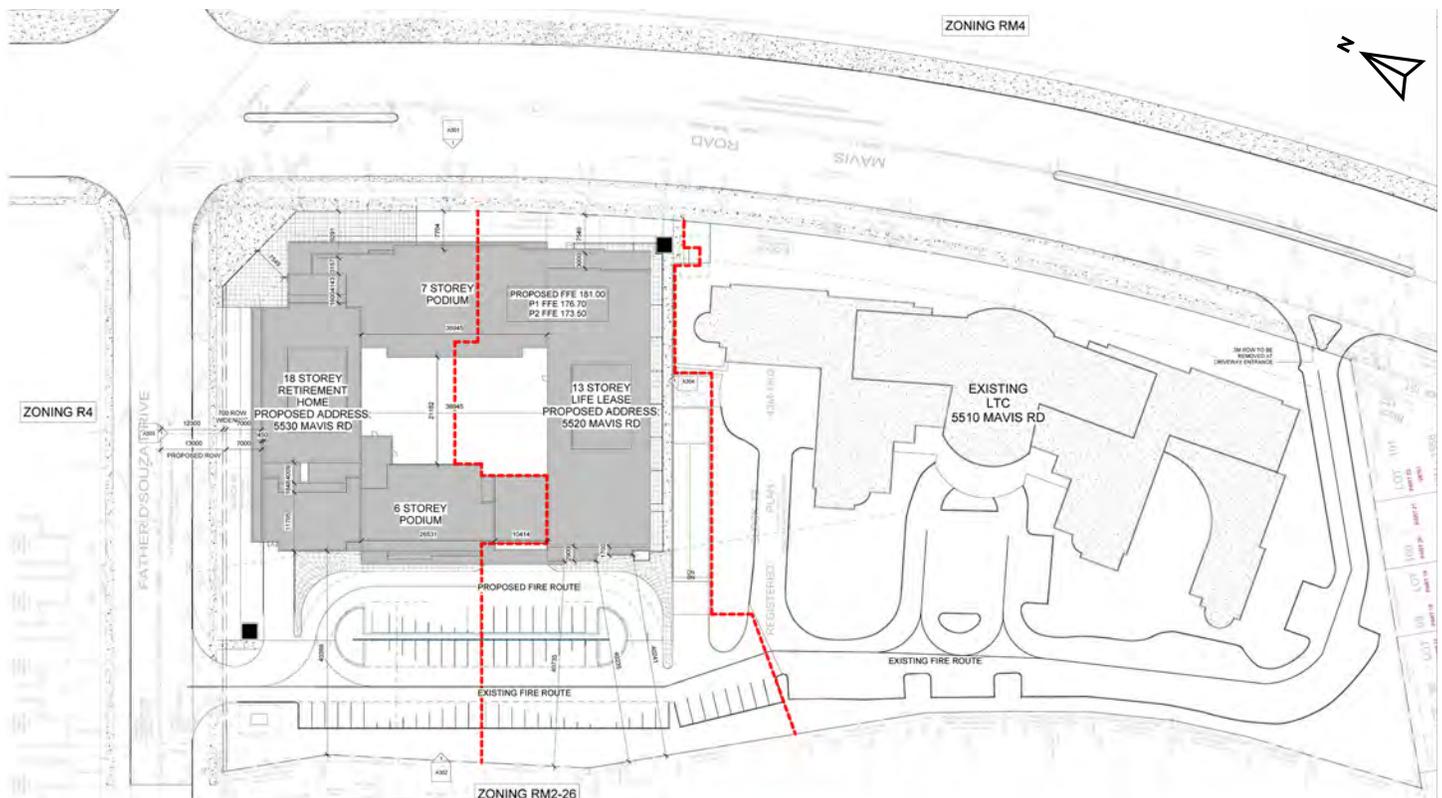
SITE PLAN OF ENTIRE SITE
